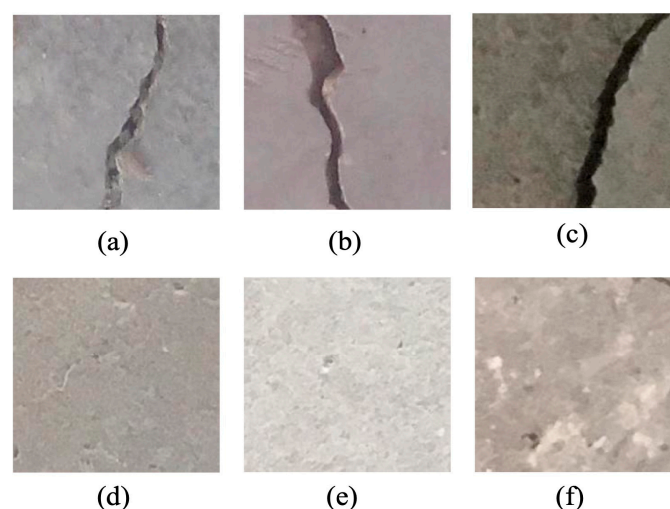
Sample dataset of concrete surfaces with crack (a–c) and without crack (d–f).
